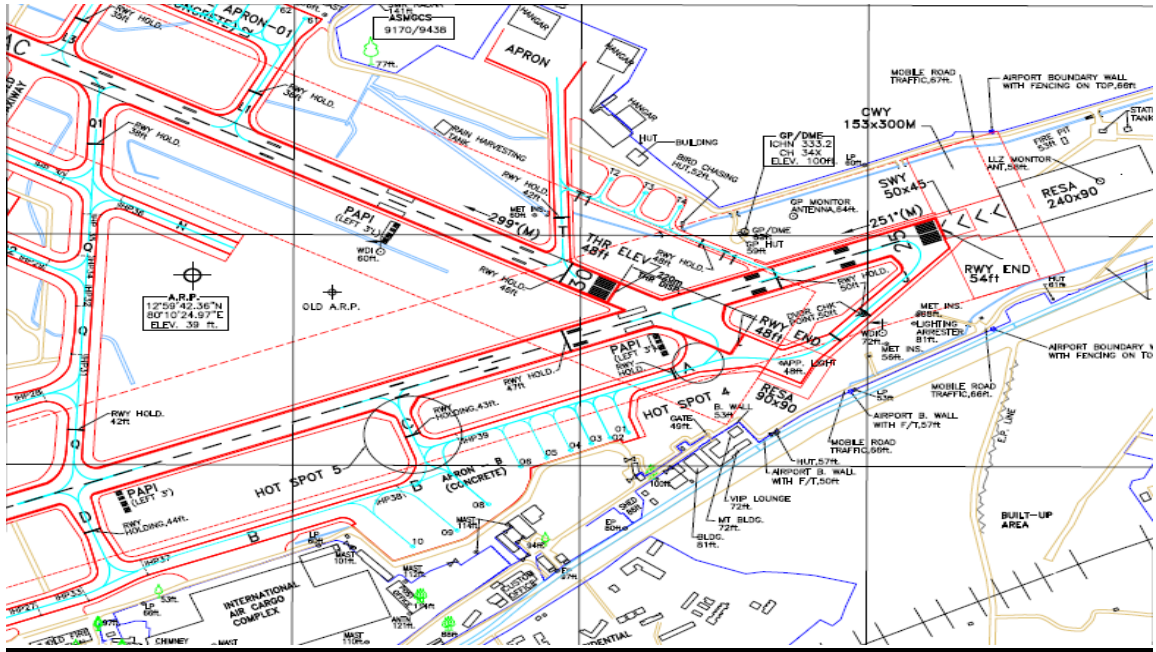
Layout of Runway 25 & Runway 30 intersection.
